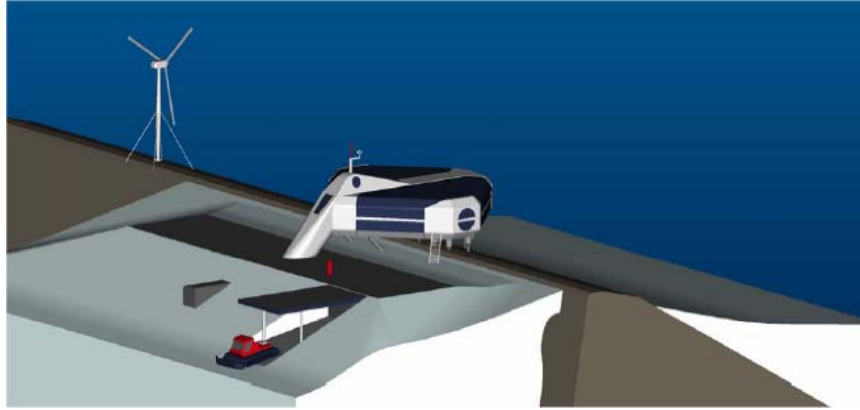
Impression of the new station at 45° wind incidence with a connection bridge with the under-snow garage/storage building. The black areas covering the surfaces of the main building are solar collectors combined with windows. Wind comes from the right.
